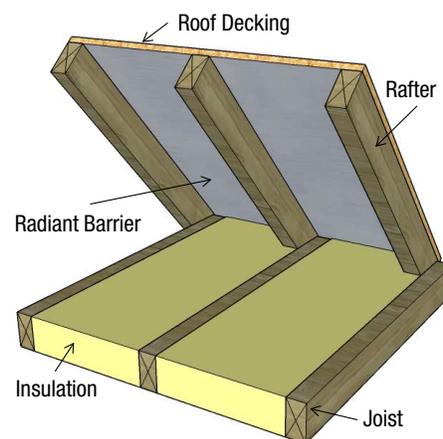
Skipped sheathing removed, solid roof decking with radiant barrier laminated to the underside installed over rafters.
